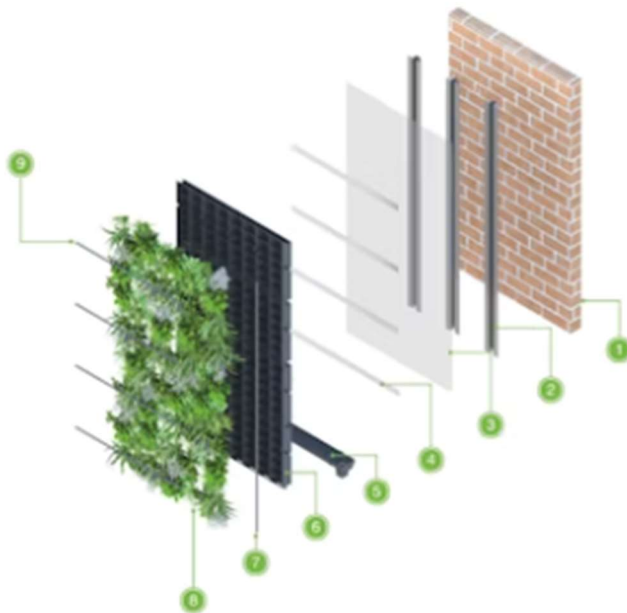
Indicative brick or concrete surface, 2. Vertical Omega carrier rail, 3. Breathable membrane, 4. Horizontal Fixing Rail, 5. Squareline Gutter or client specified, 6. ANS Living Wall Module 250x500x100mm, 7. 16mm vertical irrigation pipe, 8. Planting, 9. 16mm inline emitter pressure regulated irrigation pipe (source: Viritopia)
